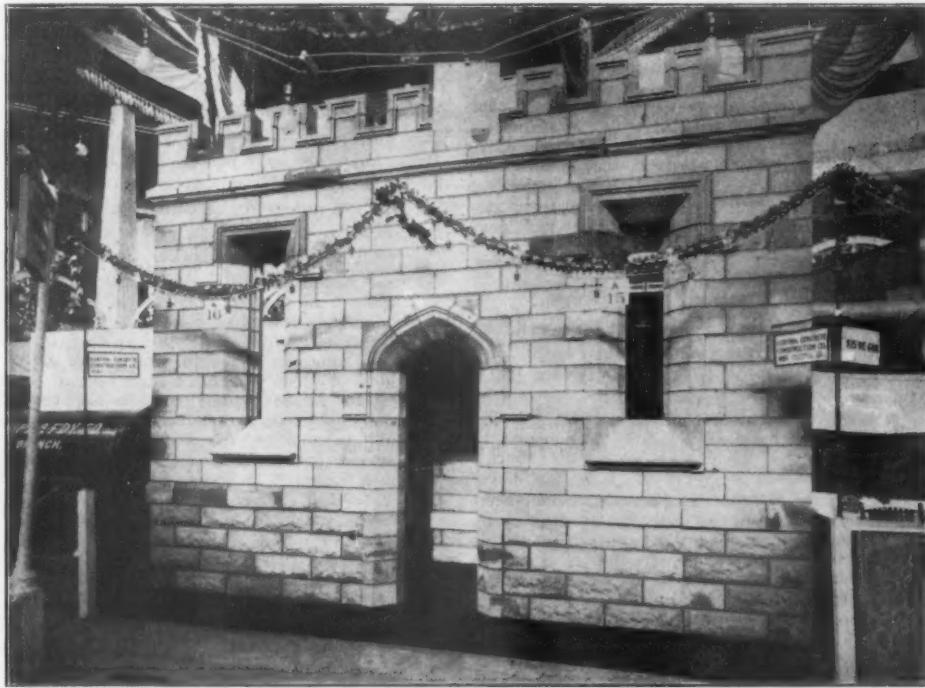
EXHIBIT OF CENTRAL CONCRETE CONSTRUCTION CO., AT THE GREATER LOUISVILLE EXPOSITION.
